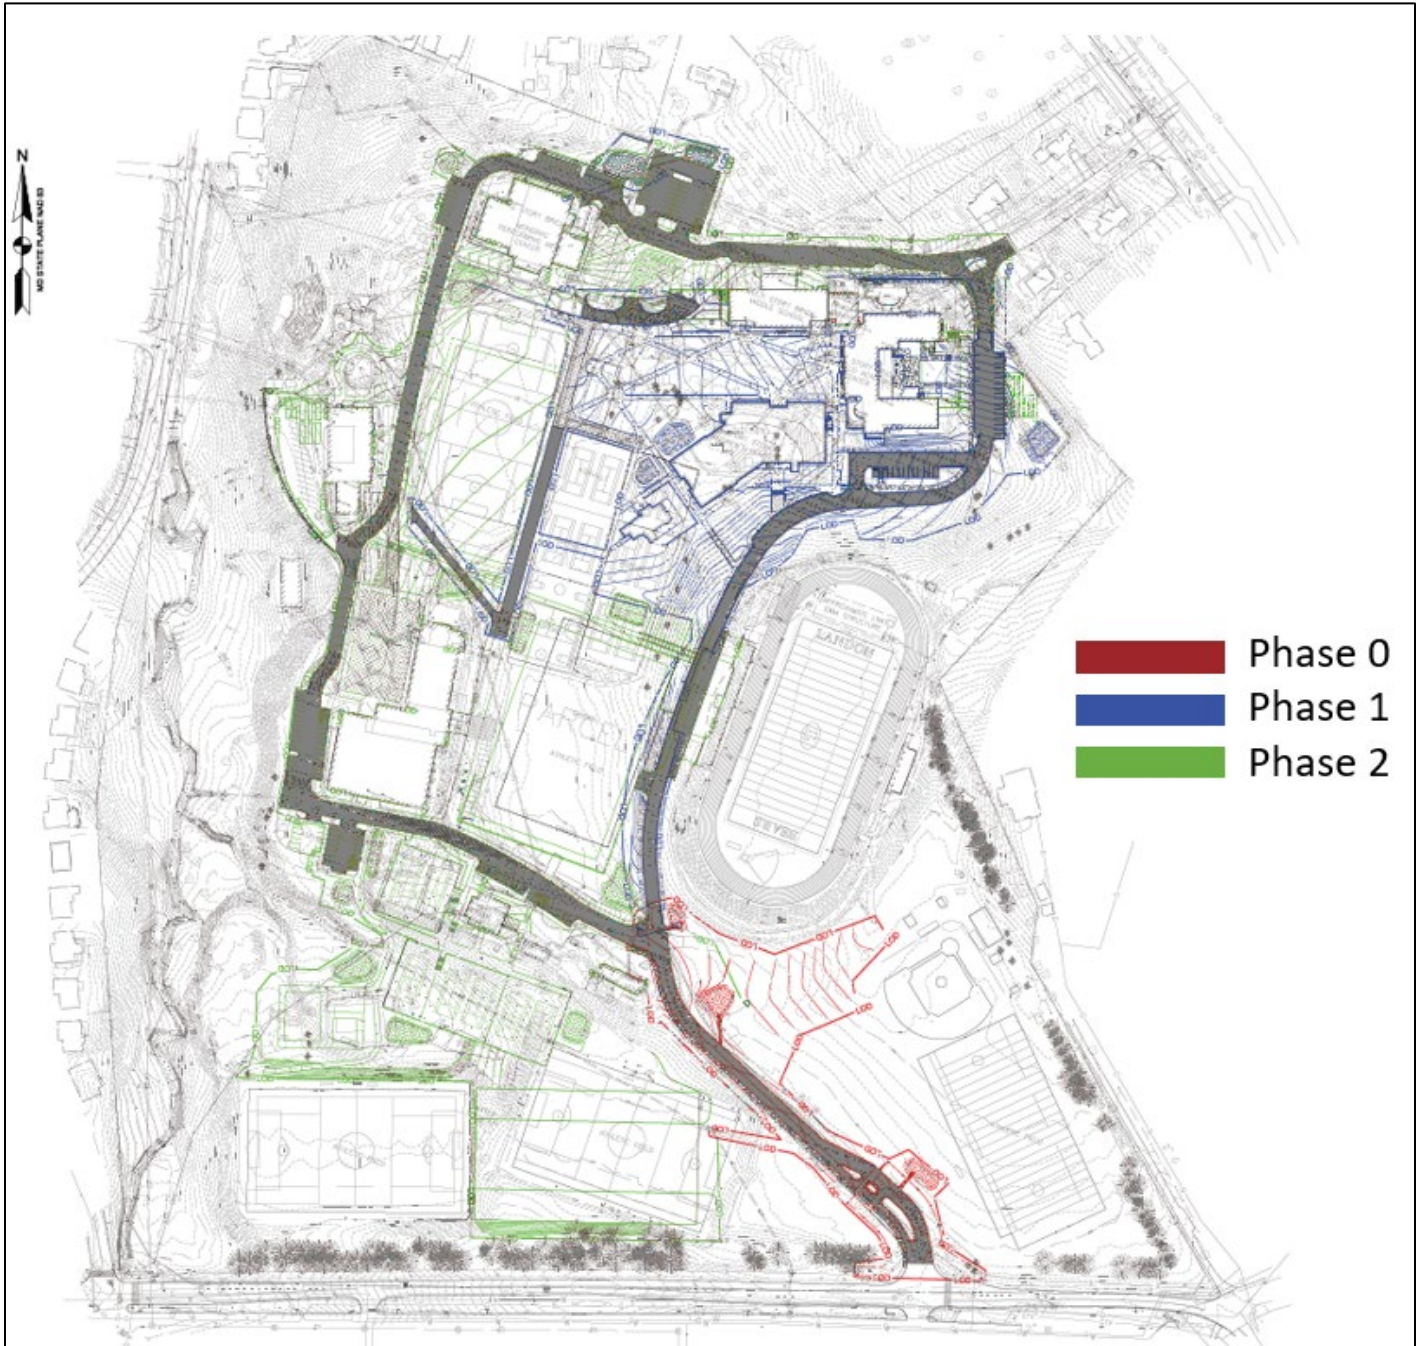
Proposed Phasing of the Landon School Campus Master Plan (site plan)
